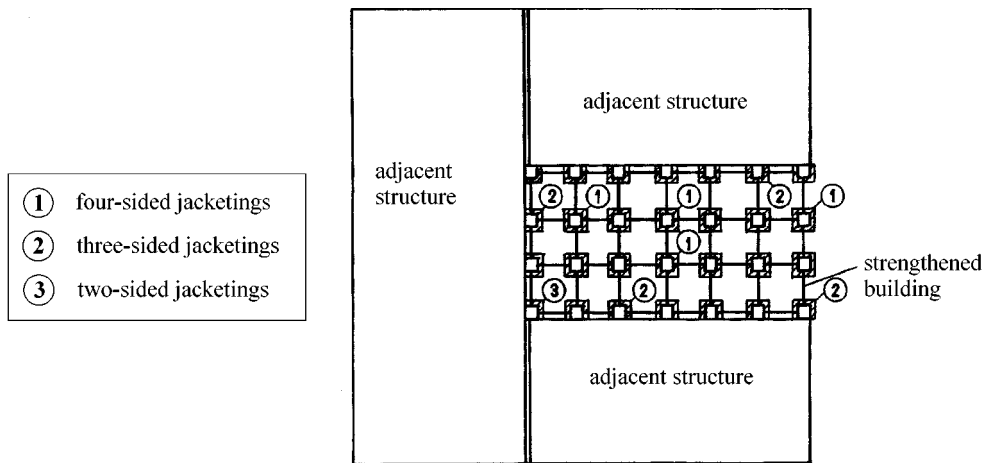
Type of jacketing of columns and beam-column joints of strengthened building with adjacent structures
